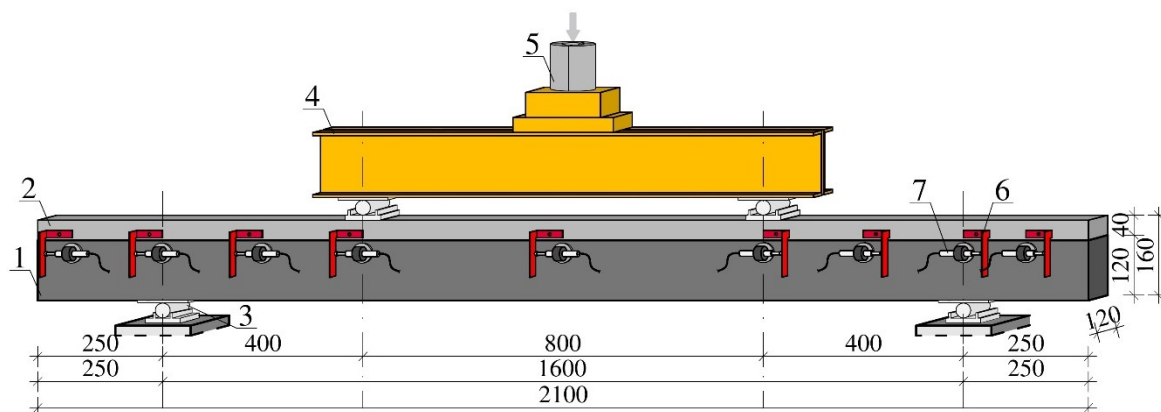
Test stand of initial test beam: 1- precast, 2- overlay, 3- support, 4- steel traverse, 5- force gauge, 6- slip measuring base, 7- LVDT sensor
